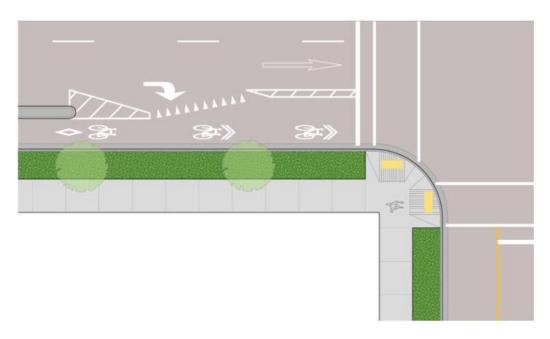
Mixing Zone Intersection (Source: BCAT, 2019)
